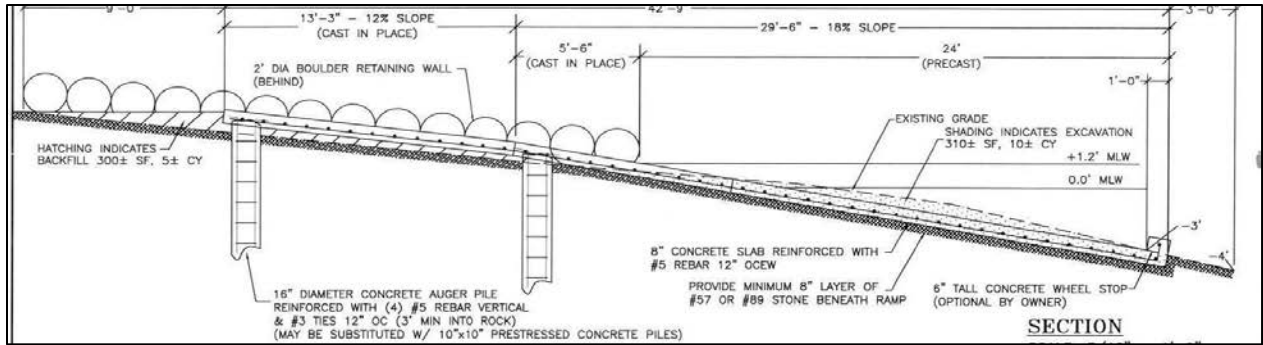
Example drawing of a boat ramp installed by placing prefabricated concrete slabs. Note that excavation for this example was minimal (removed approximately 10 cubic yards in this instance) and limited to shaping the slope of the boat ramp. This ramp extends to -3 ft MLW. Drawings prepared by Glen Boe and Associates, Inc. submitted to NMFS as part of a consultation request.
